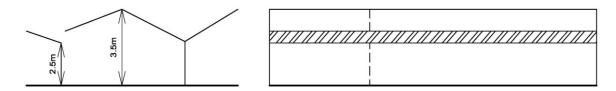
Front and side view of a greenhouse with one side continuous roof ventilation greenhouse.
